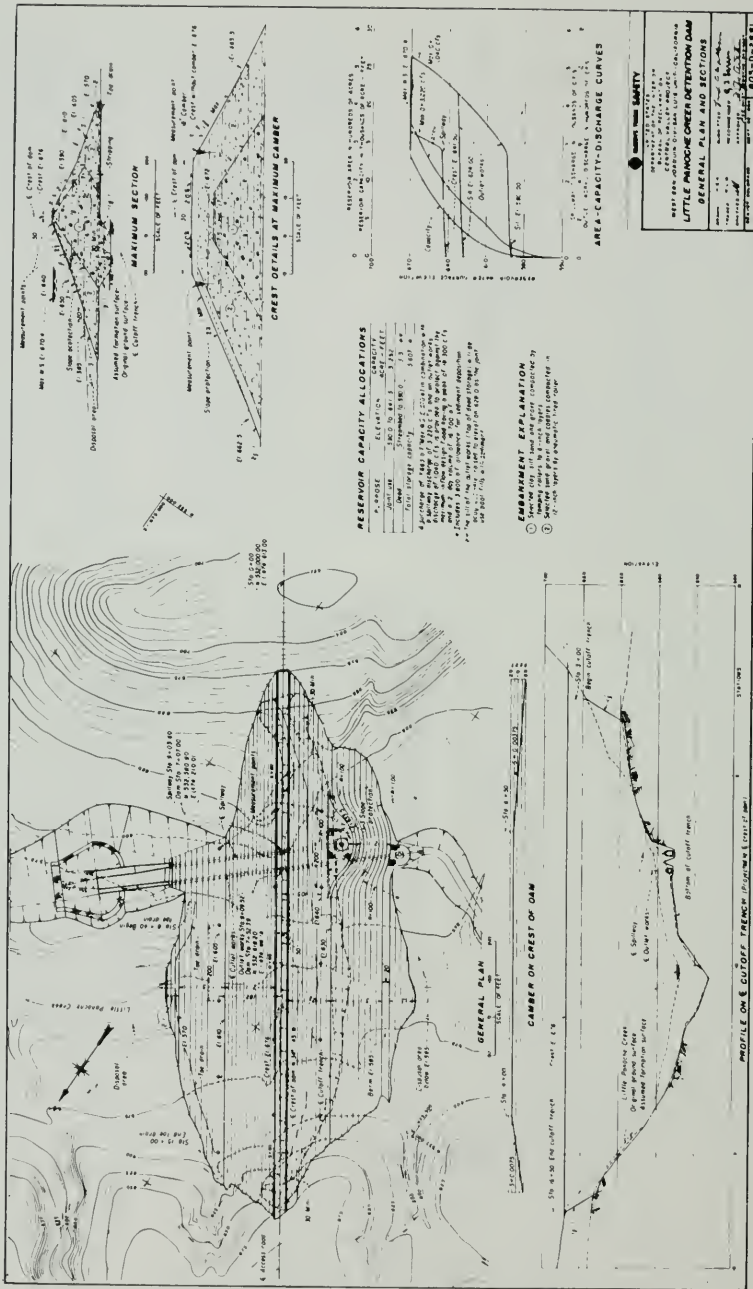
Little Panoche Detention Dam—Plan, Profile, and Sections
